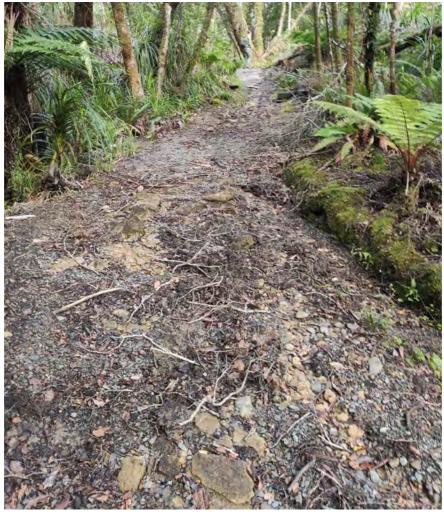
Track surface damage between Junctions 4 and 5, this section is likely water damaged also.
